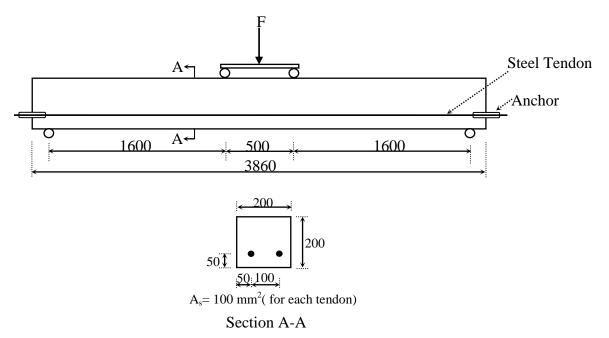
Geometrical properties of the test specimen (all dimensions in mm)[9]
